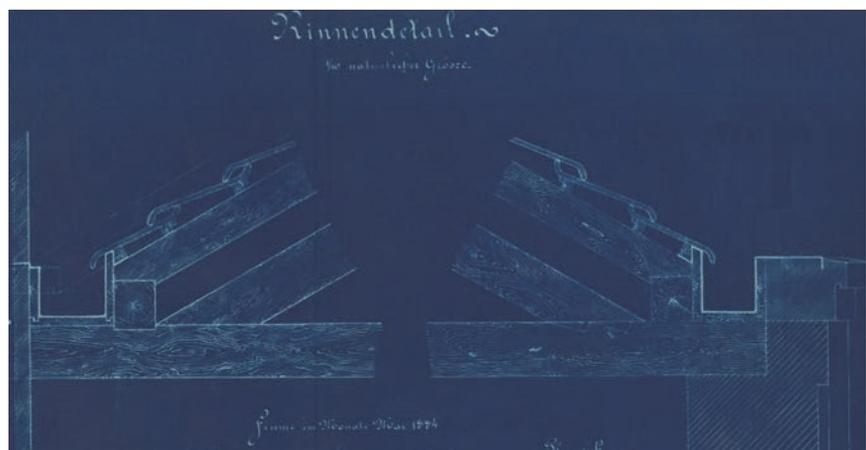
Engine room for hydraulic plant, 1884: structural detail [11]
